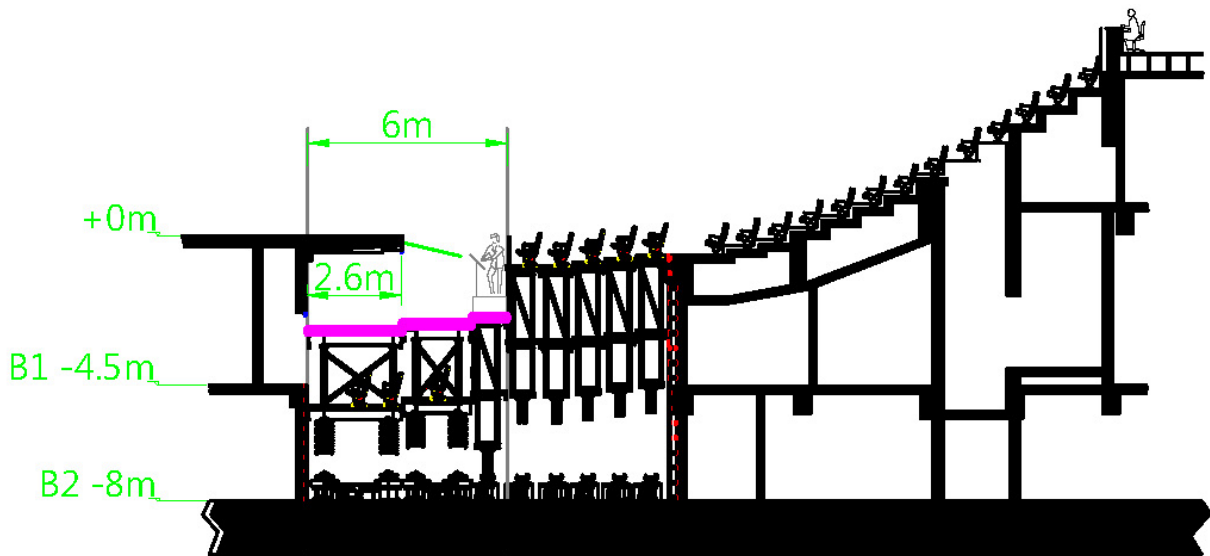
Orchestra Pit Elevation Platform Section
